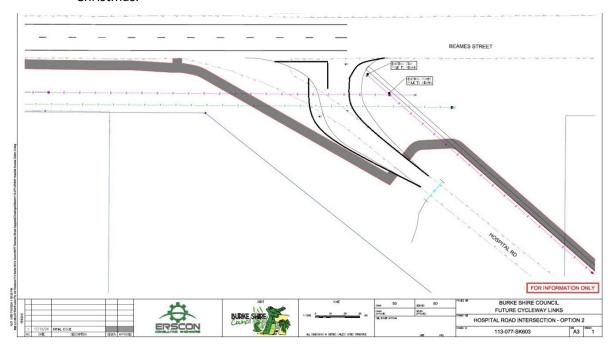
Proposed plan for the rectification of the alignment of Hospital Road intersection
